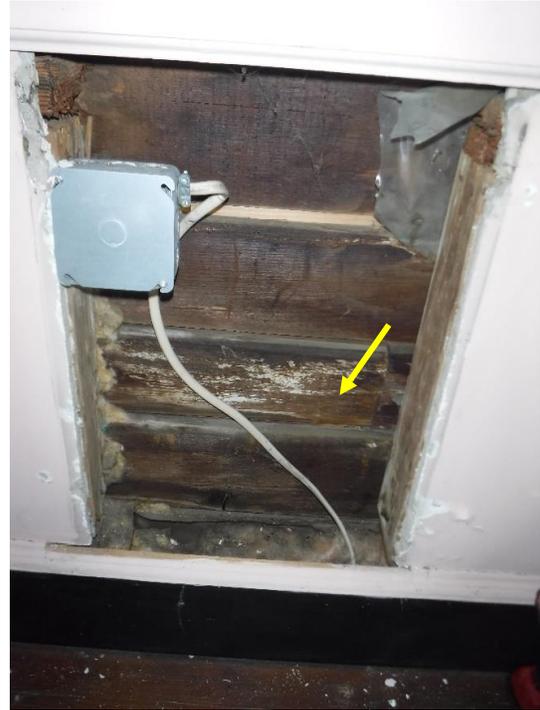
Access hatch opened in room 203 revealing backside of clapboard. Note white coating on one board.
